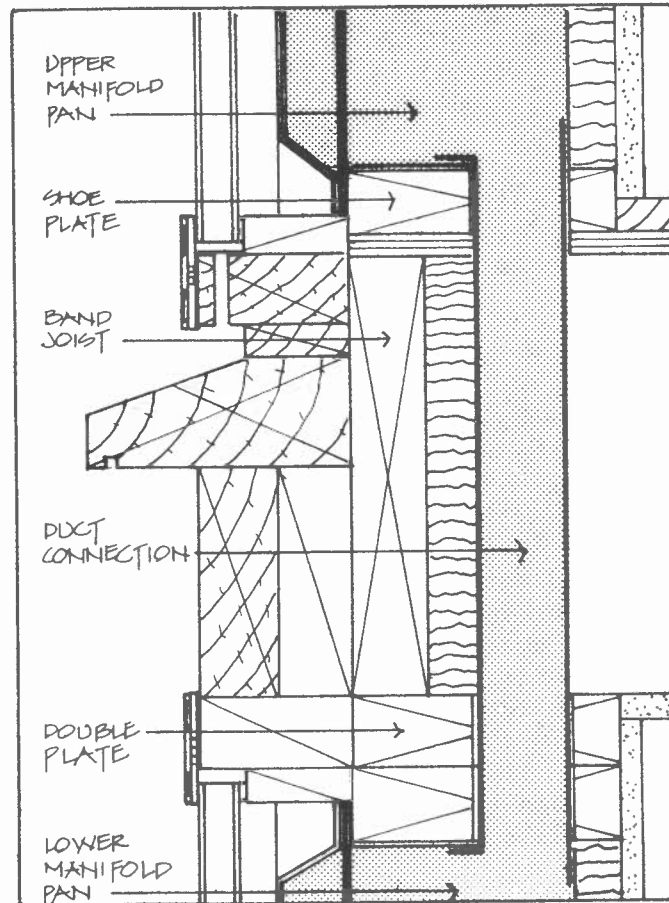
Vertical Section of Two Story Wall Collector at Intersection With Floor
